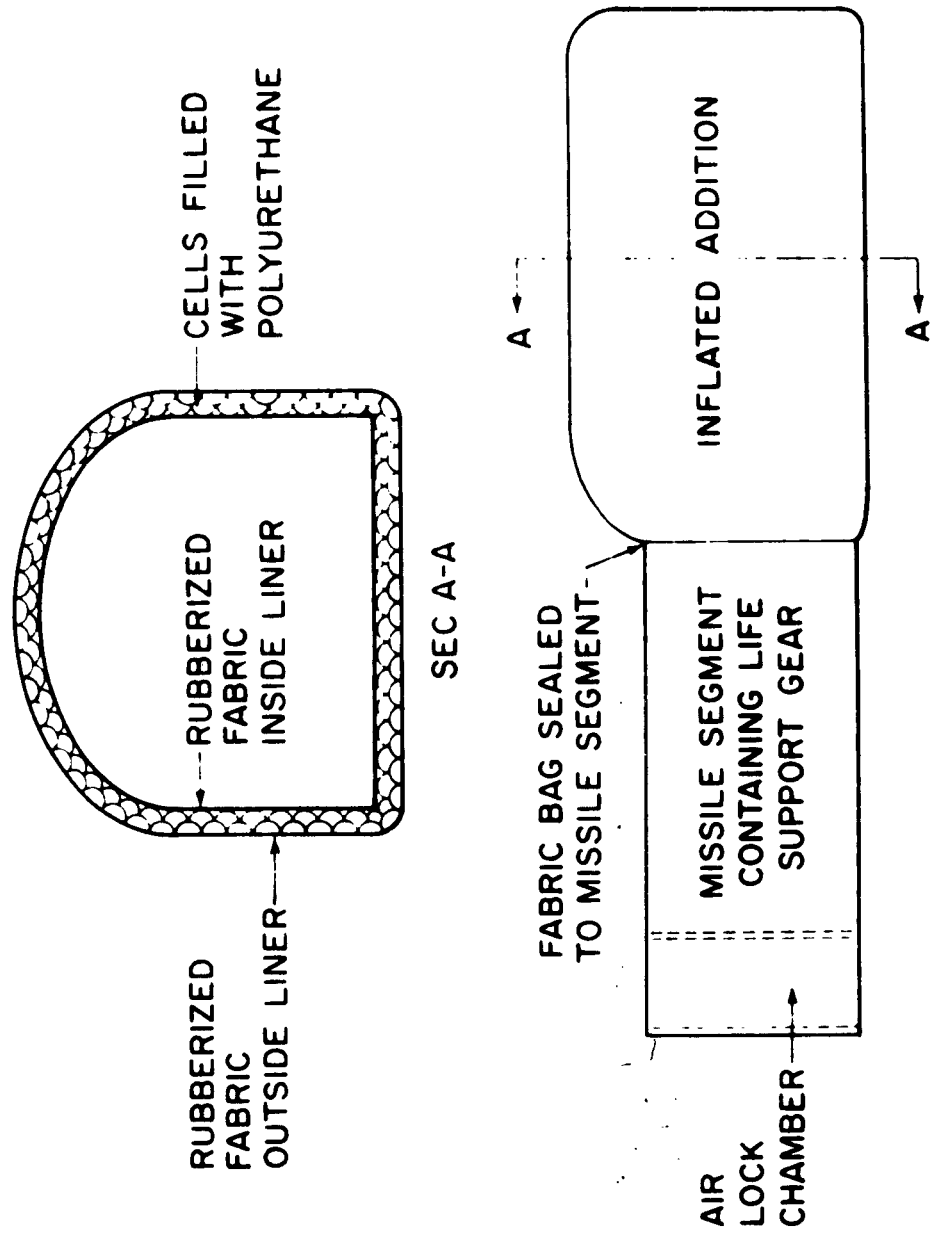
Initial expansion of living facilities for first crew landing on Mars
